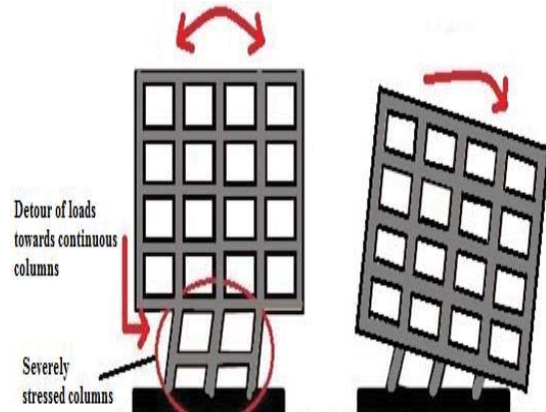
Overloading of columns in ground storey cause failure during strong earthquake shaking
